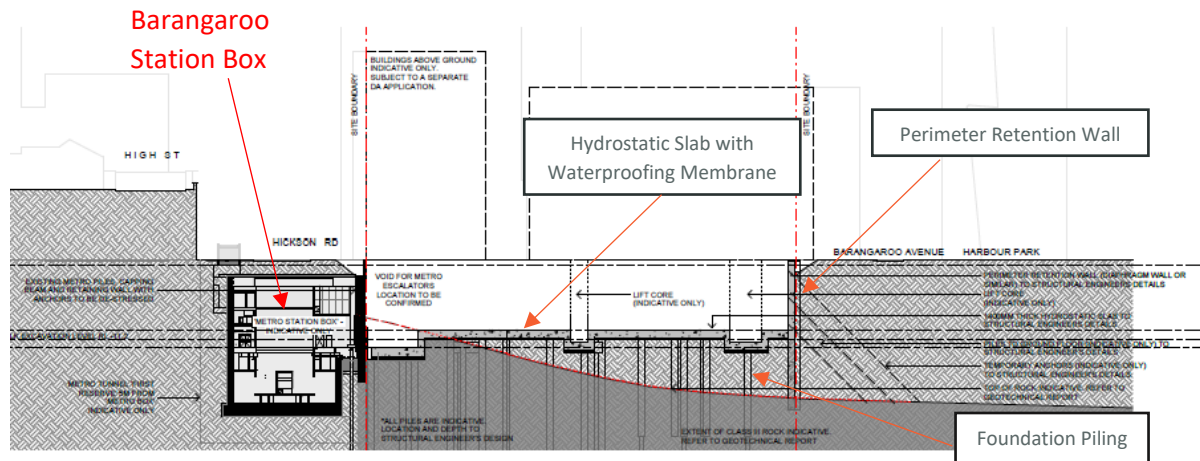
Section View Development Site & Sydney Metro Infrastructure
